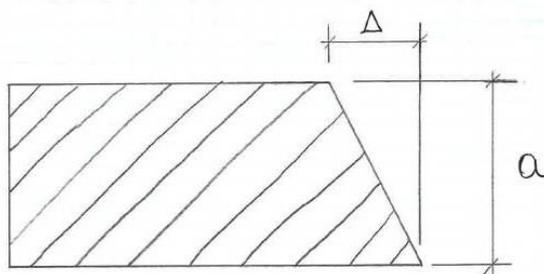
Cross-Section Slab, Beam and others Dimension of Elements
